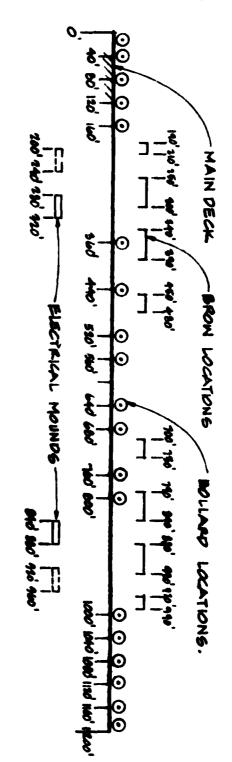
PIER UTILITY OUTLET LOCATIONS
